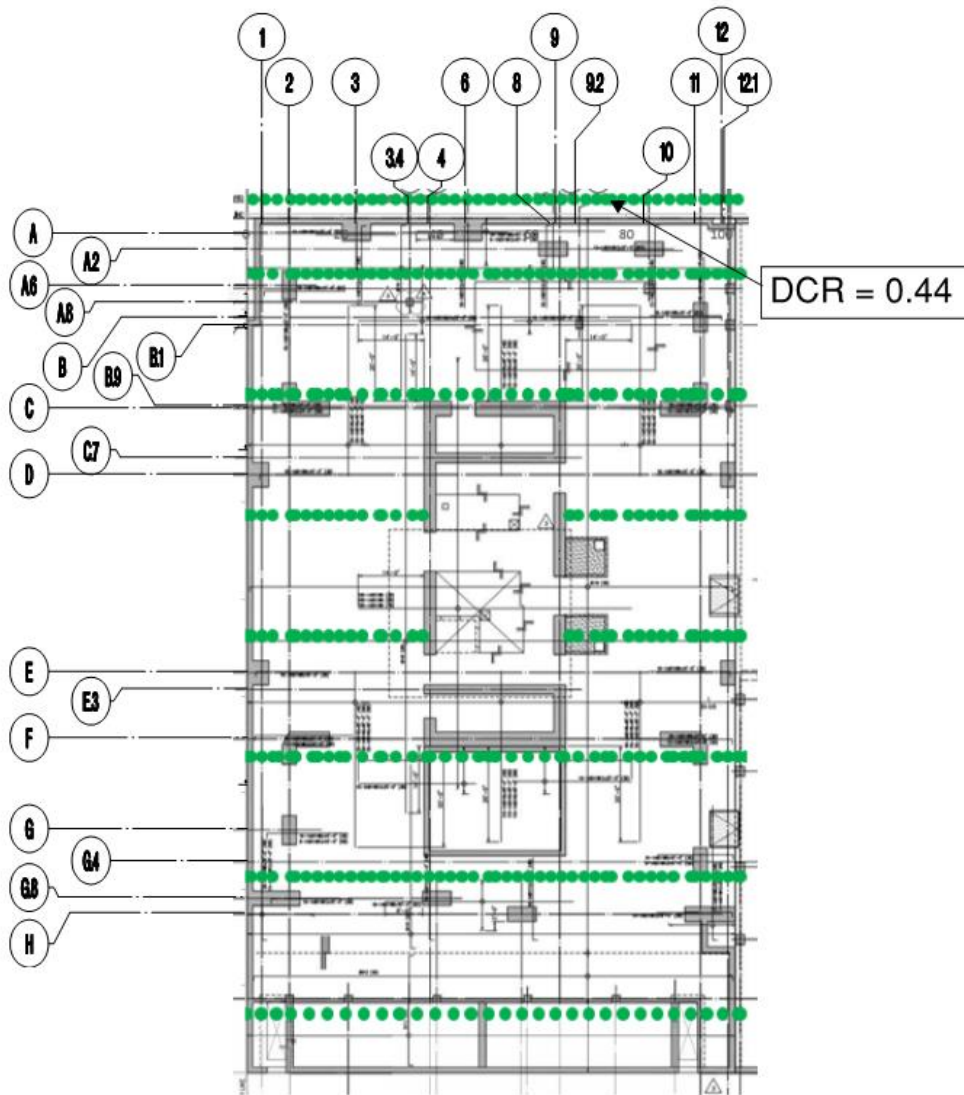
DCR Plot for East-West Bottom Reinforcement Design Strips for Gravity Load Envelope with Jacking Loads
